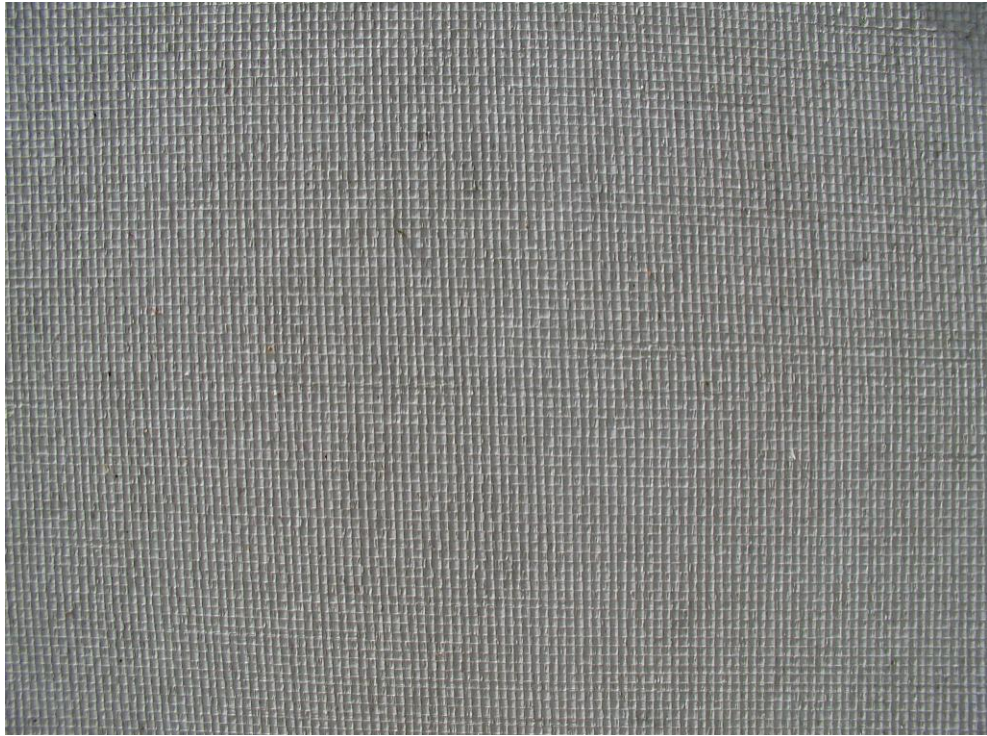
Close up view of the texture of a fabric formed concrete wall (C.A.S.T. 2008)
